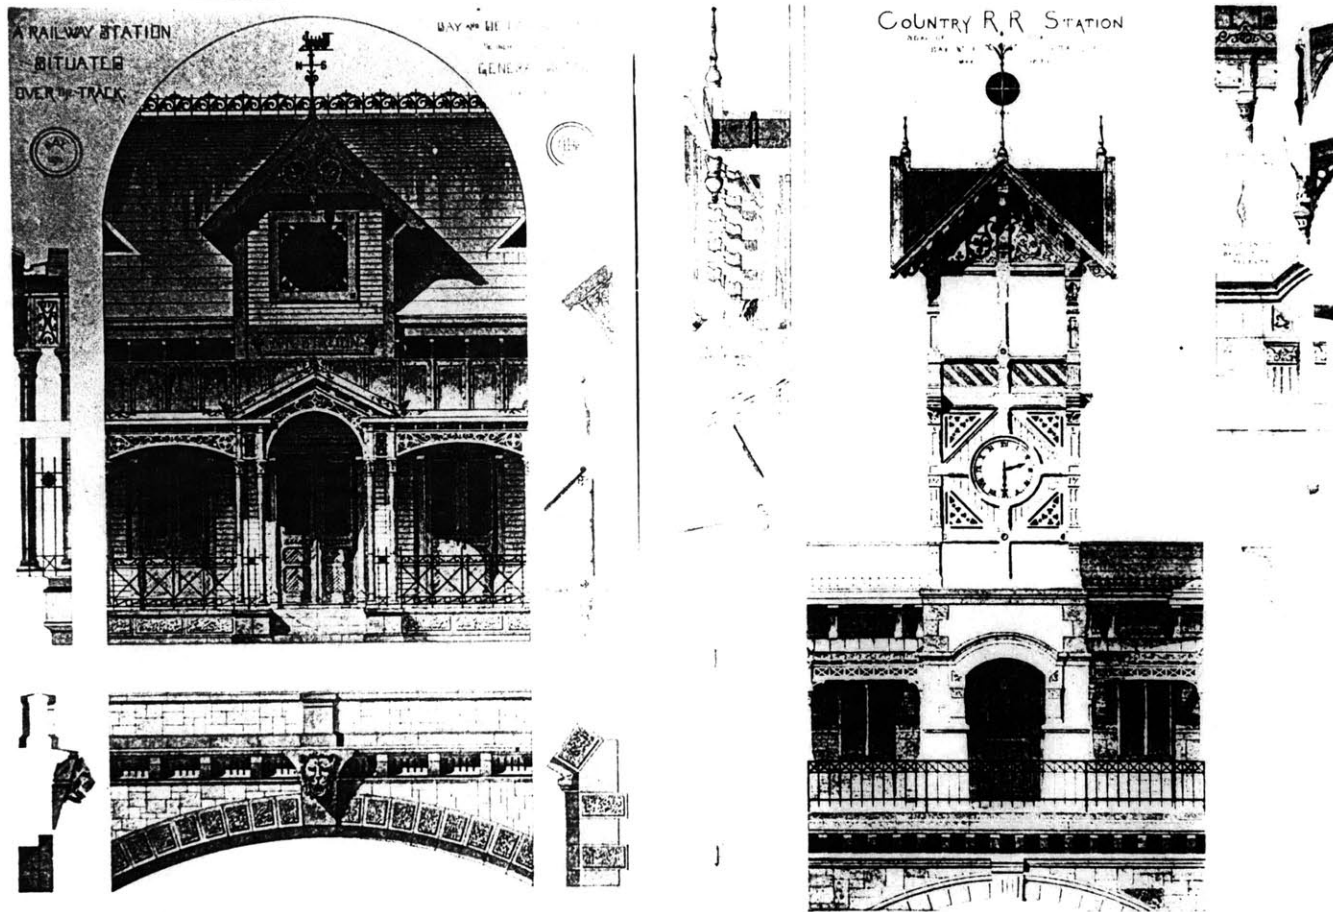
Left: E.H. Barnard, Design Problem: Railroad Station, 1874;
